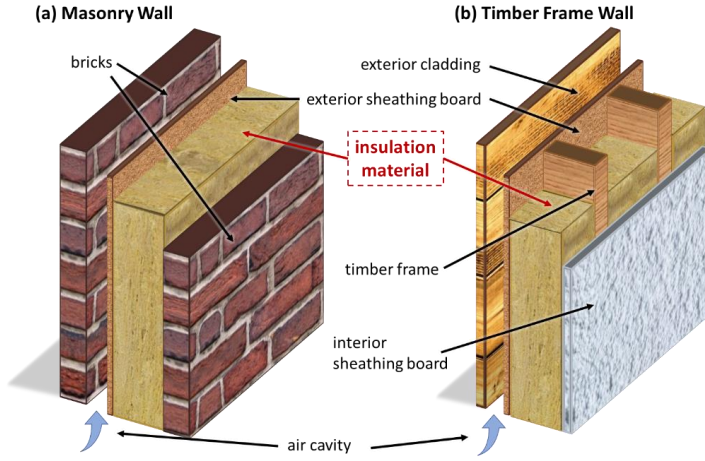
Simulated wall assemblies (a) brick wall and (b) timber frame wall with air cavity.
